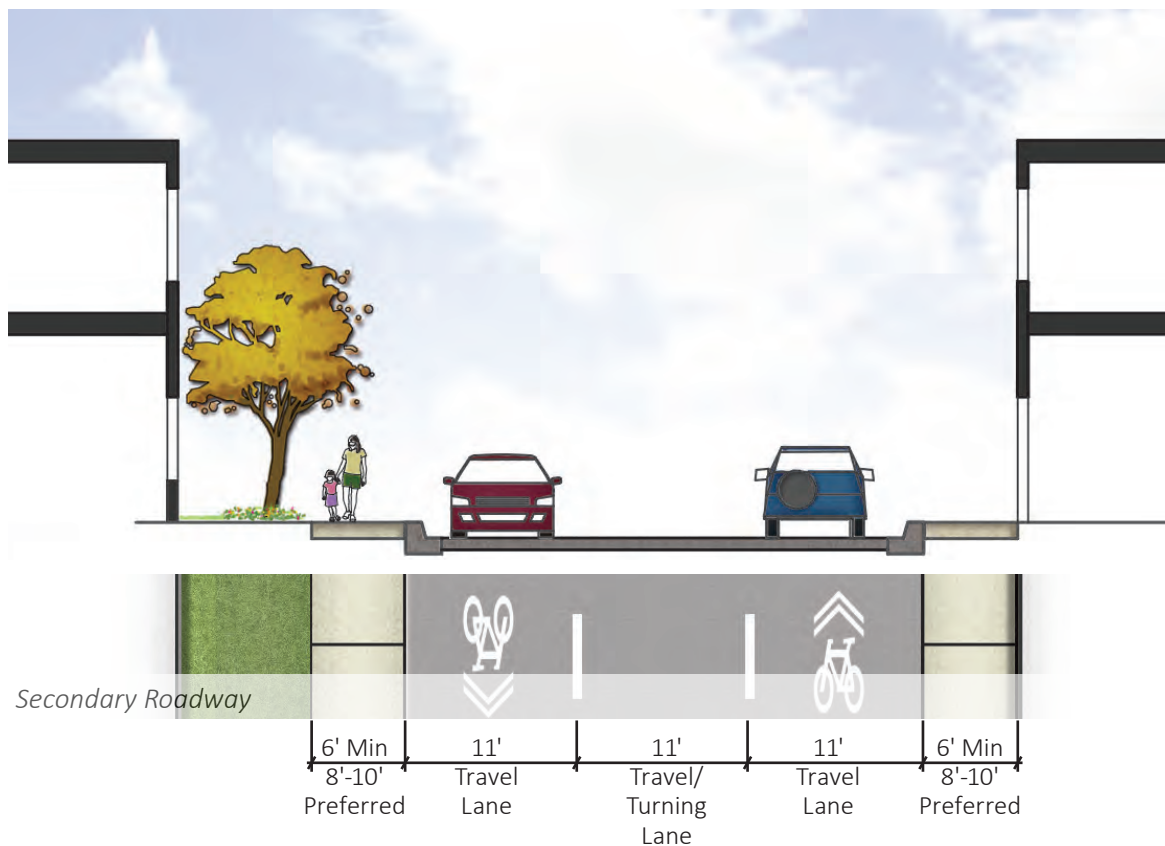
SECONDARY ROADWAY STREET SECTION
